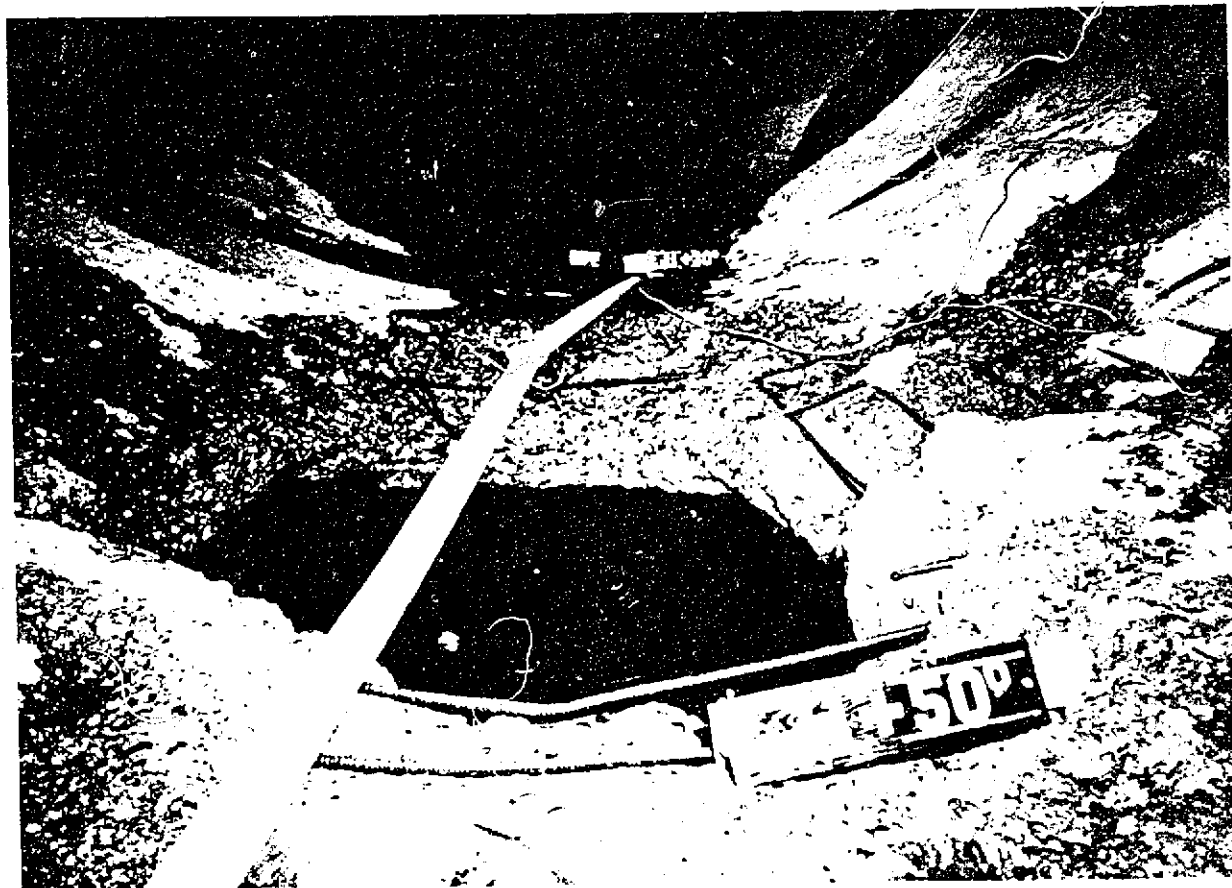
Major damaged area in horizontal reach of tunnel. Photo P459-640-4170
